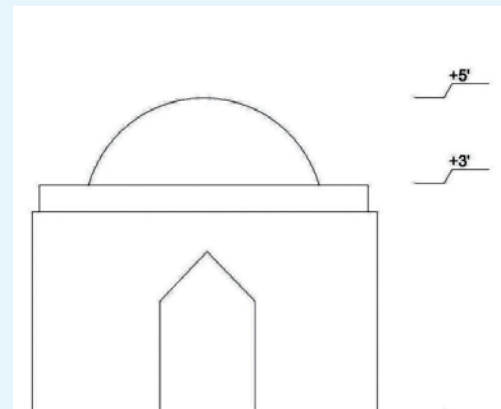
Storage Room I- front elevation (drawing by Researcher)
